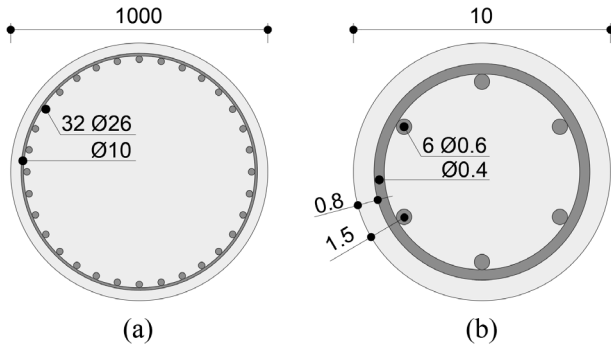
RC piles cross-section: (a) prototype and (b) model; dimensions are given in mm.
